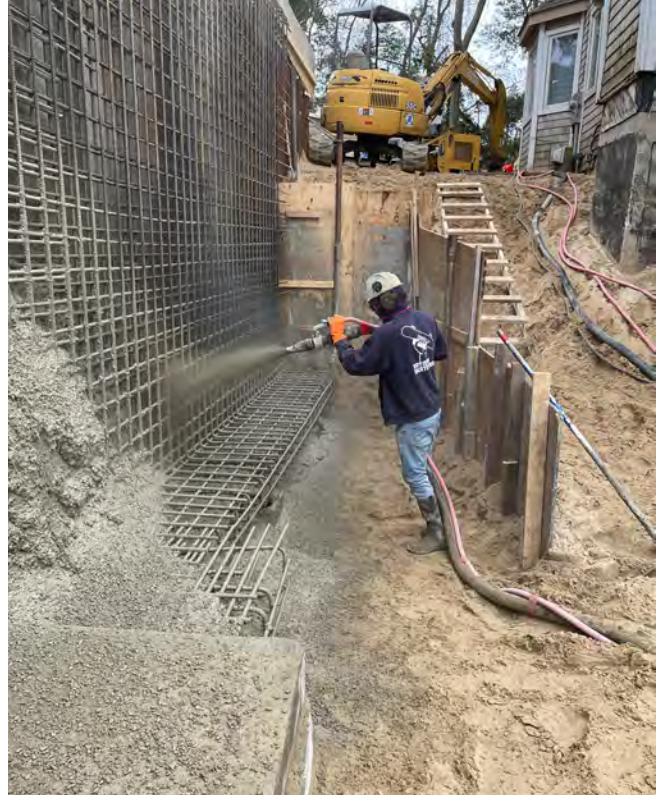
ACI-Certified Nozzleman shooting wet-mix on the 21 ft retaining wall.
